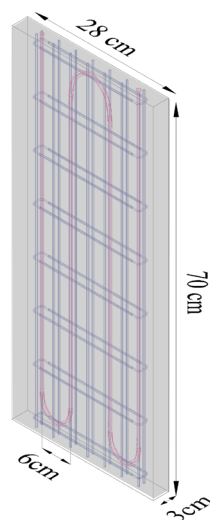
Cross-sectional details of the laboratory model of the RGEW and heat exchanger specifications.
